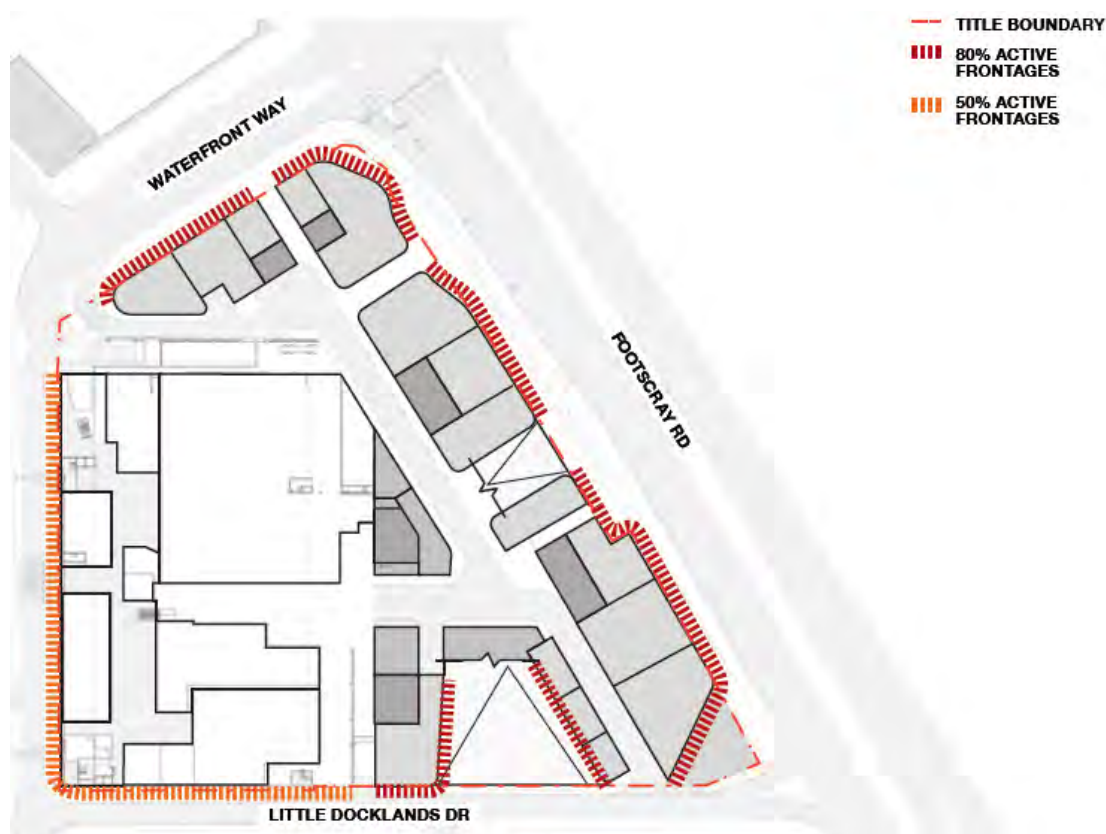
Concept Plan 4 - Ground Floor Public Realm Activation from the original proposal
